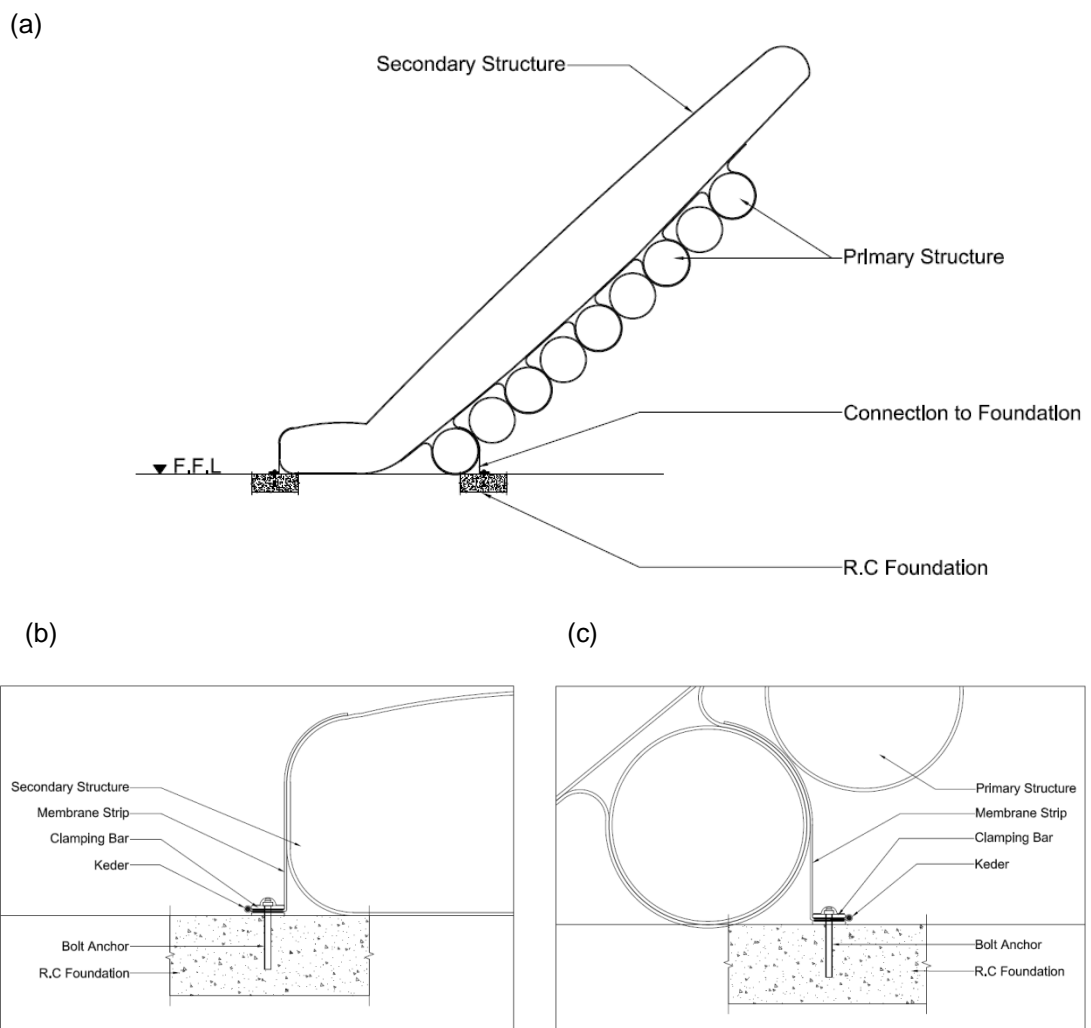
15: Fixing of the membrane to foundation (a) Section view. (b) Fixing at secondary structure; (c) Fixing at primary structure.
